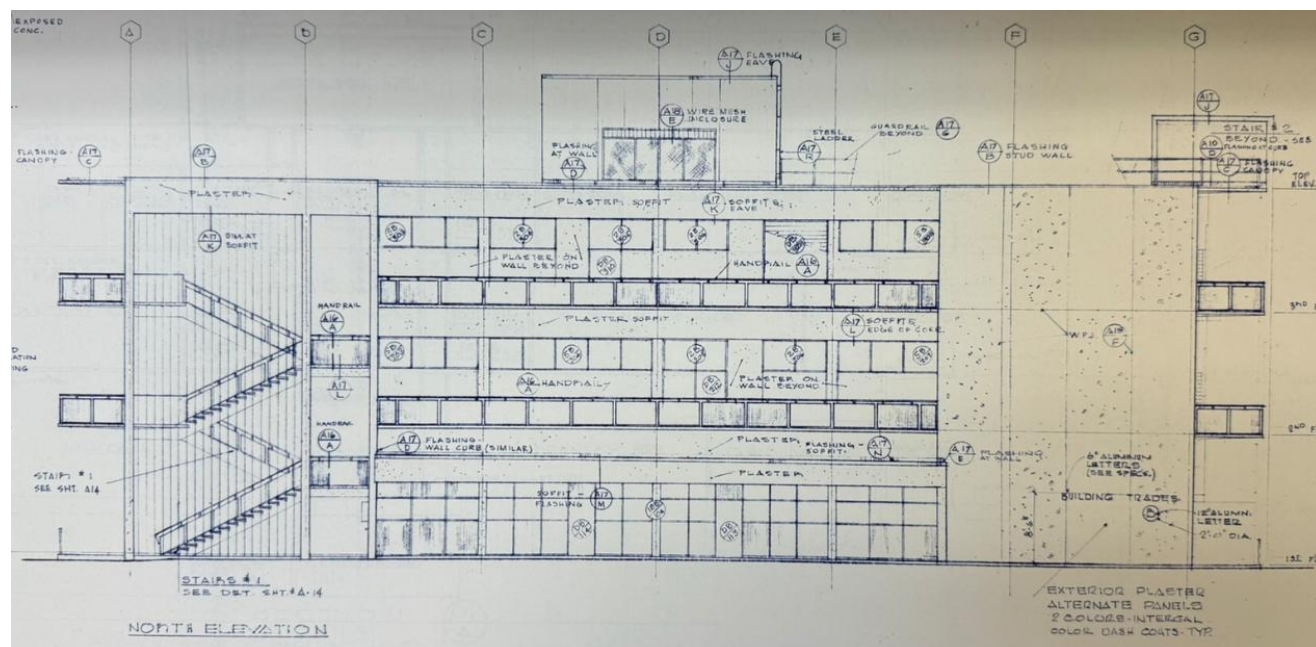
1959 drawing of CMU Building (E2), north elevation (LATTC 2025)
